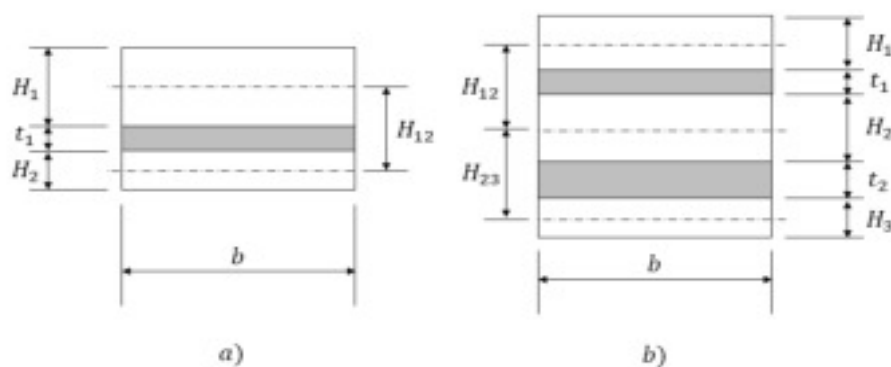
Section of a sandwich (a) and a multi-layered (b) glass beam.
